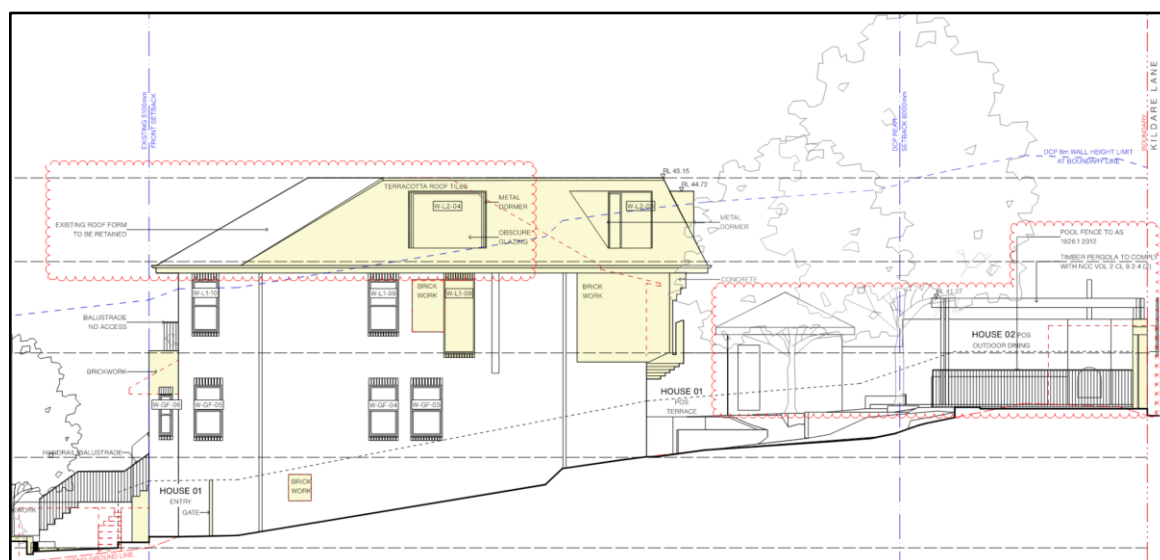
Eastern elevation of proposed additions at 10 Moore Street, showing the 8m Wall Height limit (Source: Tribe Architects)
